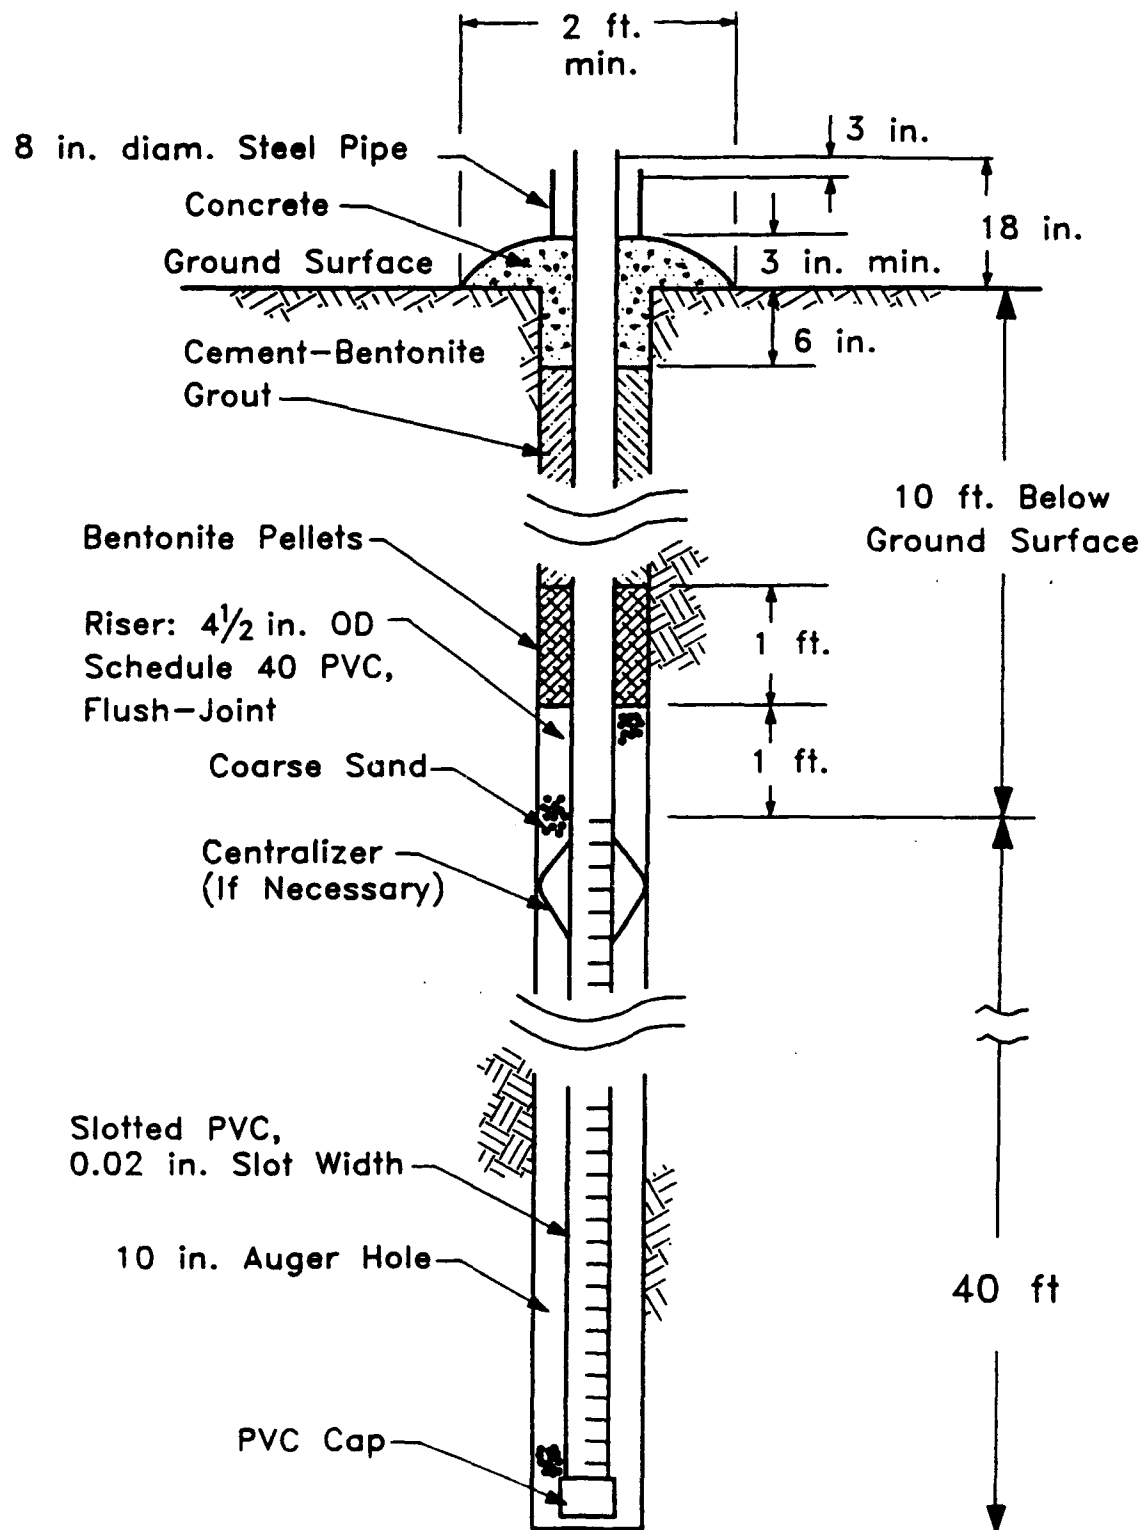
Schematic of a Typical Vent Well Design and Installation.
